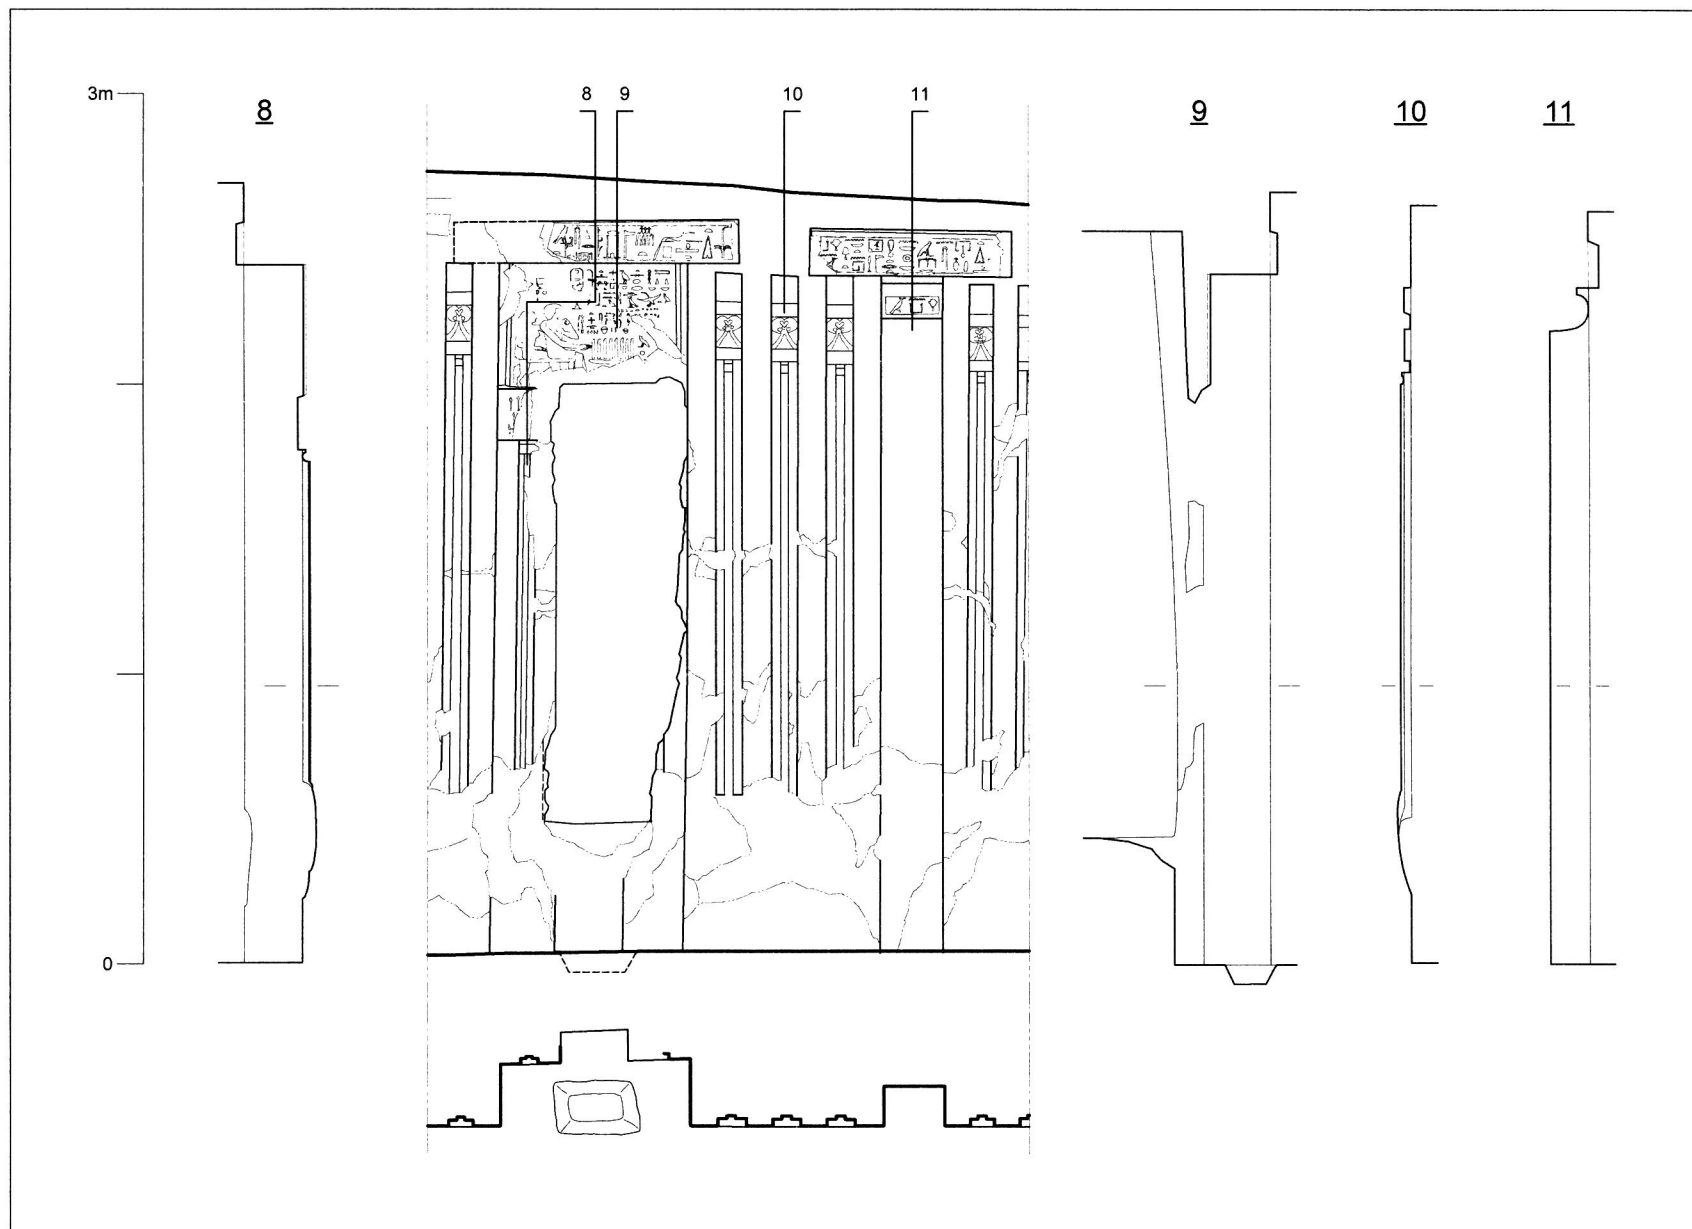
Tomb of Khafraankh. Western wall, central part, sections and plan
